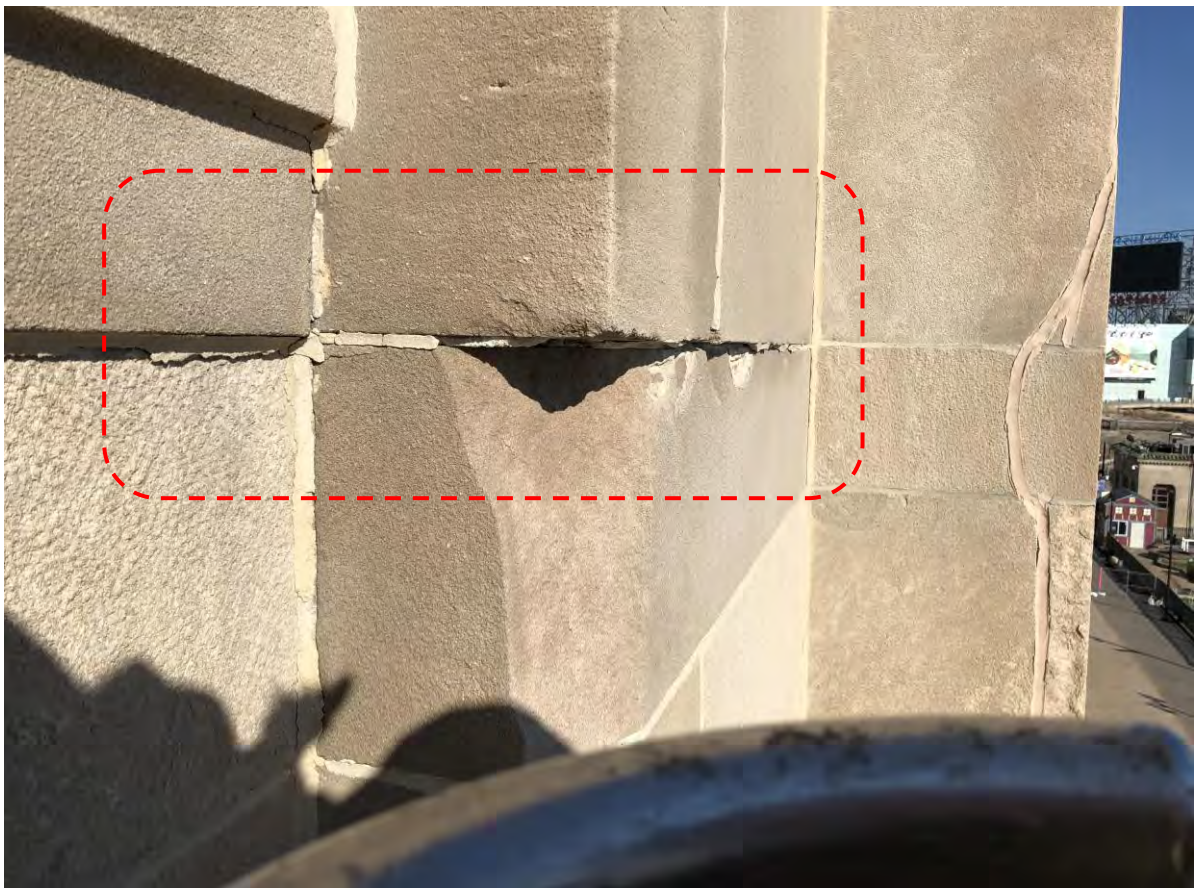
Area 5: Significant cracking, open jointing and stone movement occurring at corner, likely as a result of spandrel beam and column corrosion behind pier
